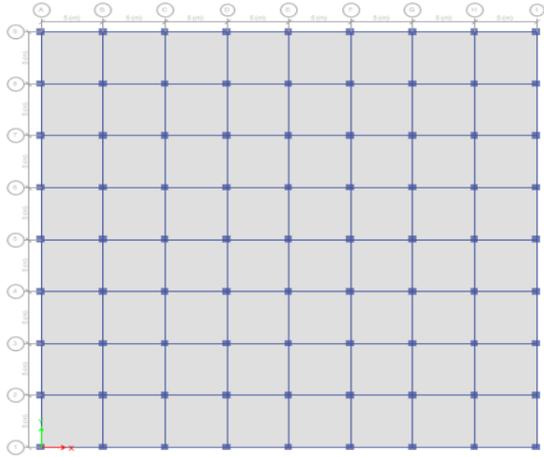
Plan view of building with Conventional Slab(CONV) model
